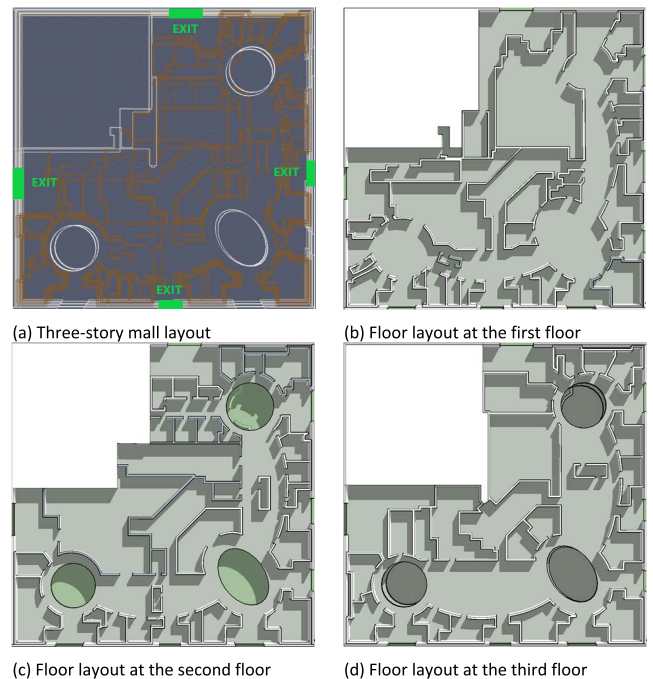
Floor layout at the three-story Taipei 101 mall.
